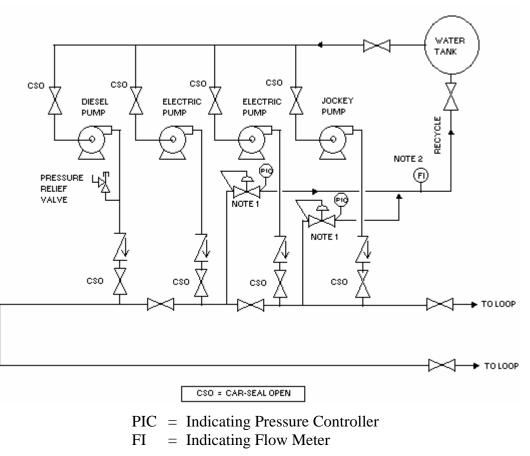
Fire Pump Piping Manifold, Typical Installation
